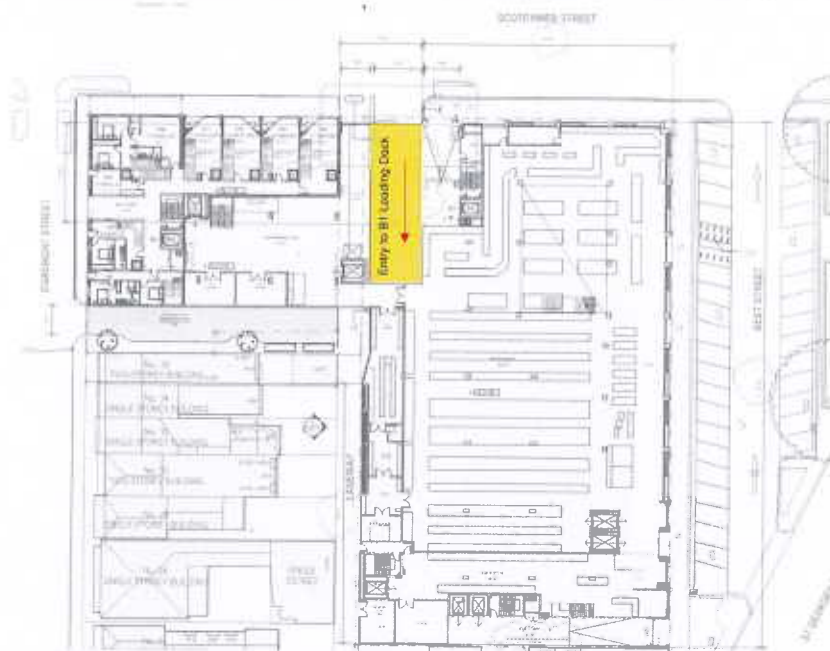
Entry to Basement 1 Loading Dock Location
